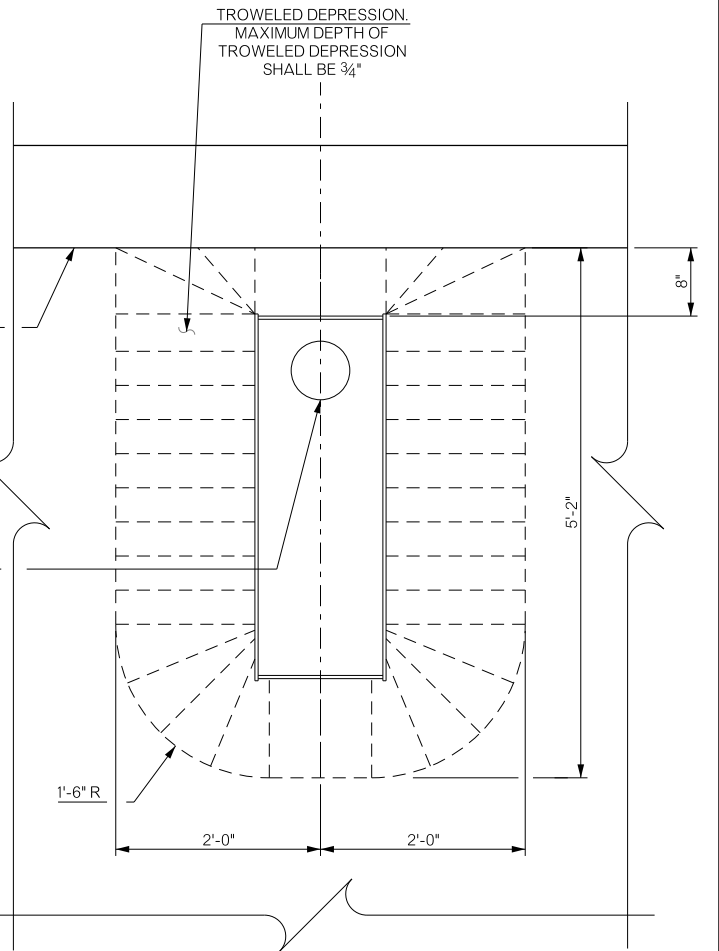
DETAIL OF BRIDGE DECK REINFORCING AT INLET LOCATION (PLAN VIEW)
